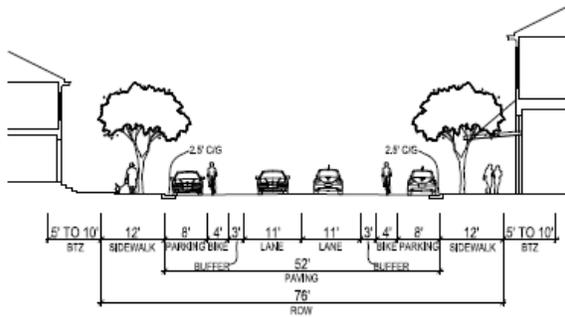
Neighborhood Street (Conceptual Cross Section)
